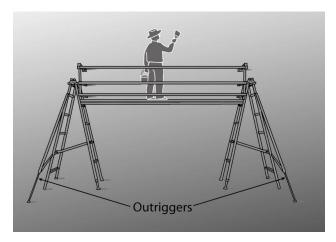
Trestle ladder scaffold with guard rails and outriggers for stability.
